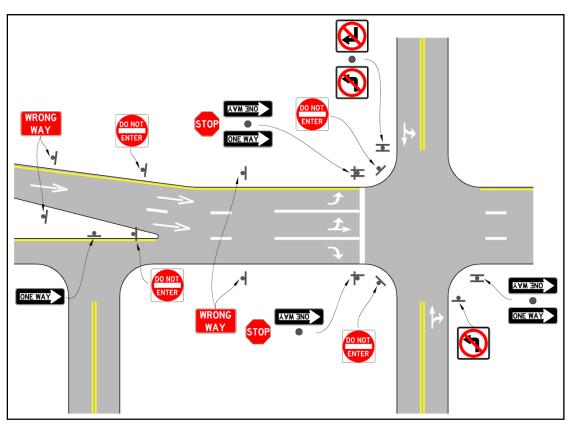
Example of signage and pavement markings at an exit ramp of a diamond interchange with a continuous frontage road in an urban area.
